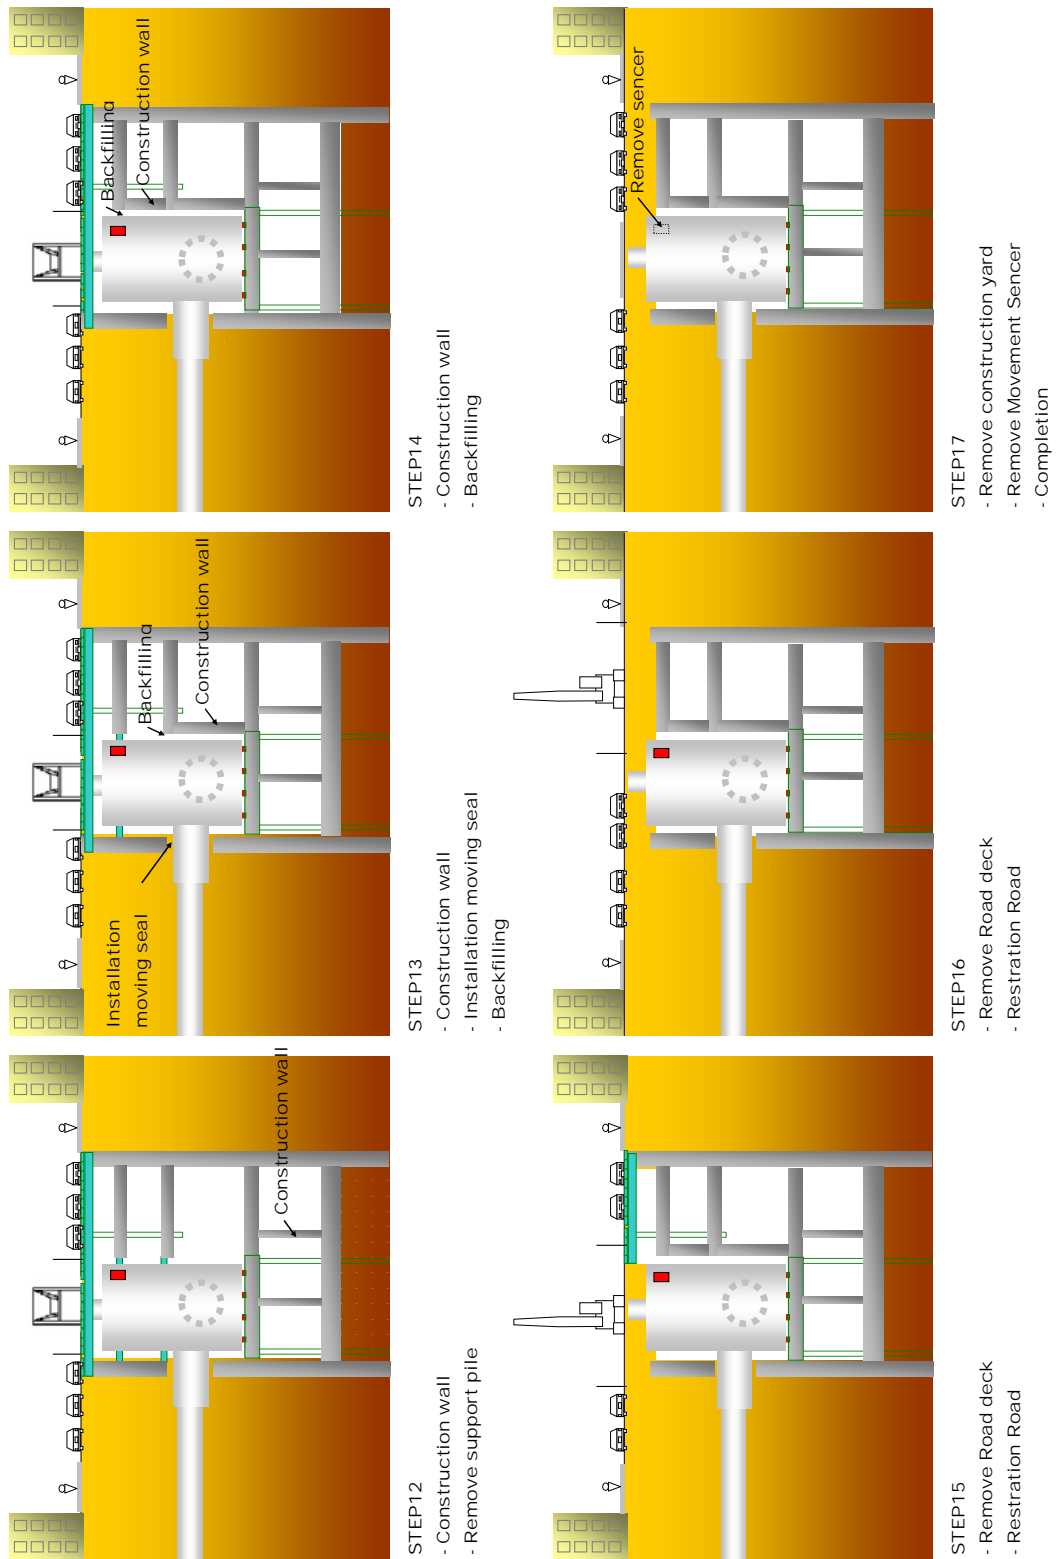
Construction Method (1) for the Manhole-affected Section of Station
